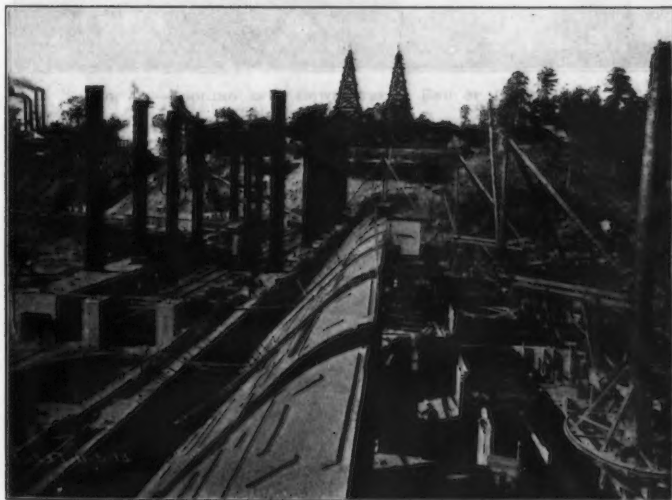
PENSTOCK FORMS UNDER CONSTRUCTION. LOCOMOTIVE CRANE SETTING UP COLUMNS OF POWER-HOUSE.
